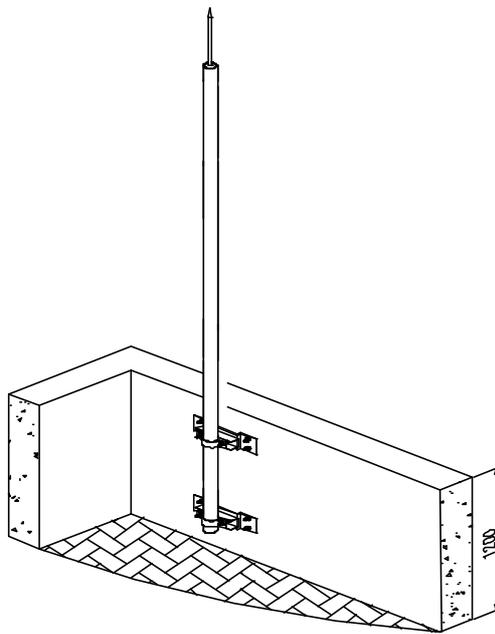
Antenna support fixed on parapet (with parapet not shorter than 1200mm)
